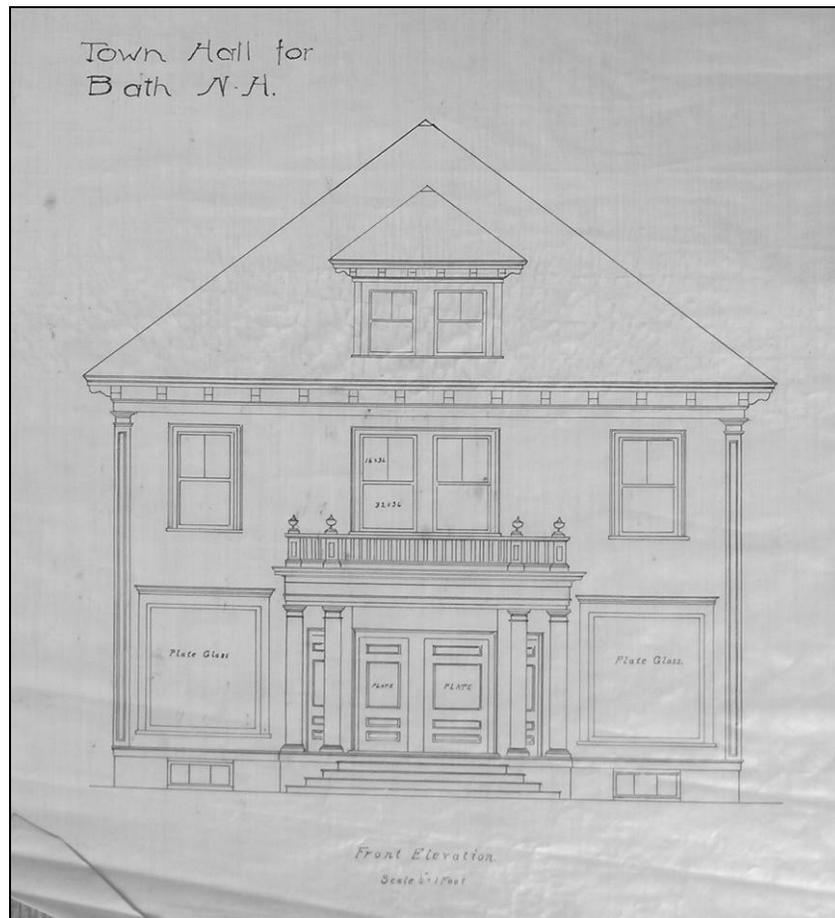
Elevation, Bath Town Hall, 1909-1910. Collection of New Hampshire Historical Society.
